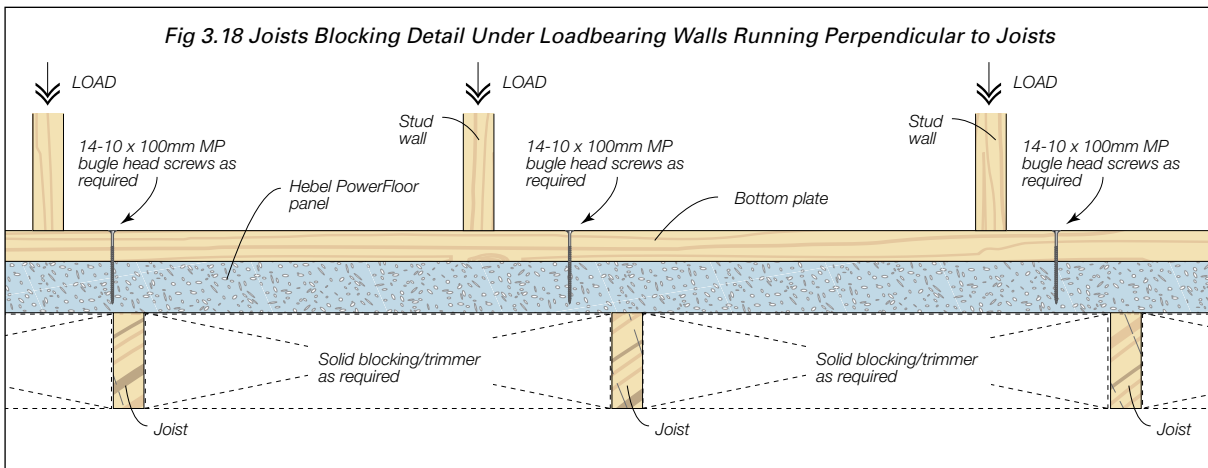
Joists Blocking Detail Under Loadbearing Walls Running Perpendicular to Joists
